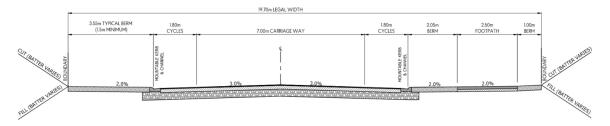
Typical Cross-Section (C) Collector – 19.7m with Cycleway
